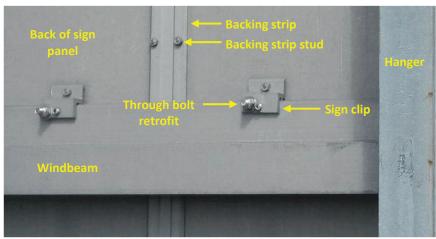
Sign panel attachment to windbeam with retrofitted through bolt
